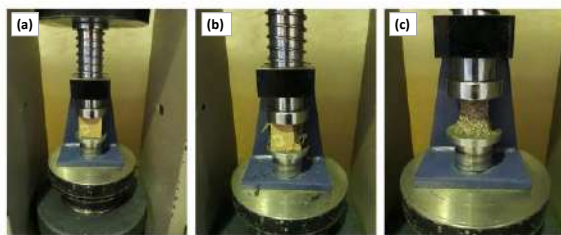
Process of the concrete sample breaking under hydraulic jack [27]
